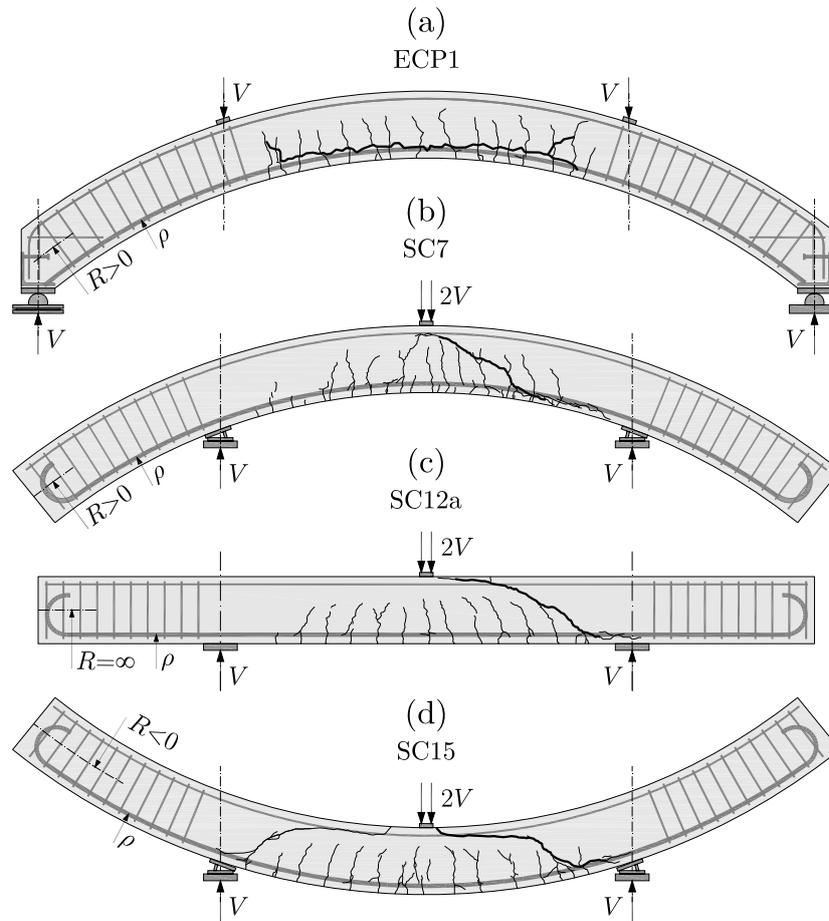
Failure of representative specimens (a) spalling failure of specimen ECP1; (b) shear failure of specimen SC7; (c) shear failure of specimen SC12a; and (d) shear failure of specimen SC15.
